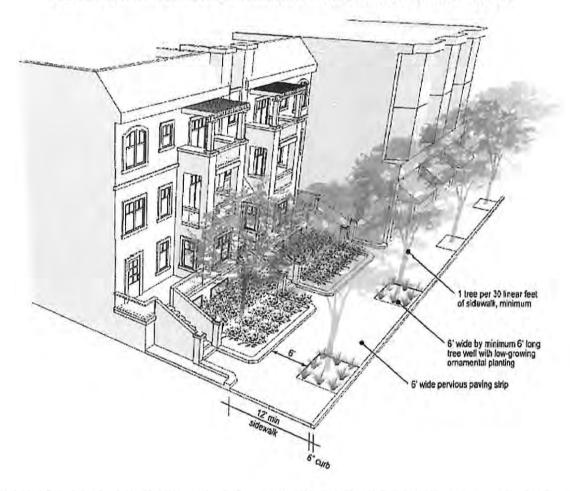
Streetscape Standards - Residential Ground Floor Uses
